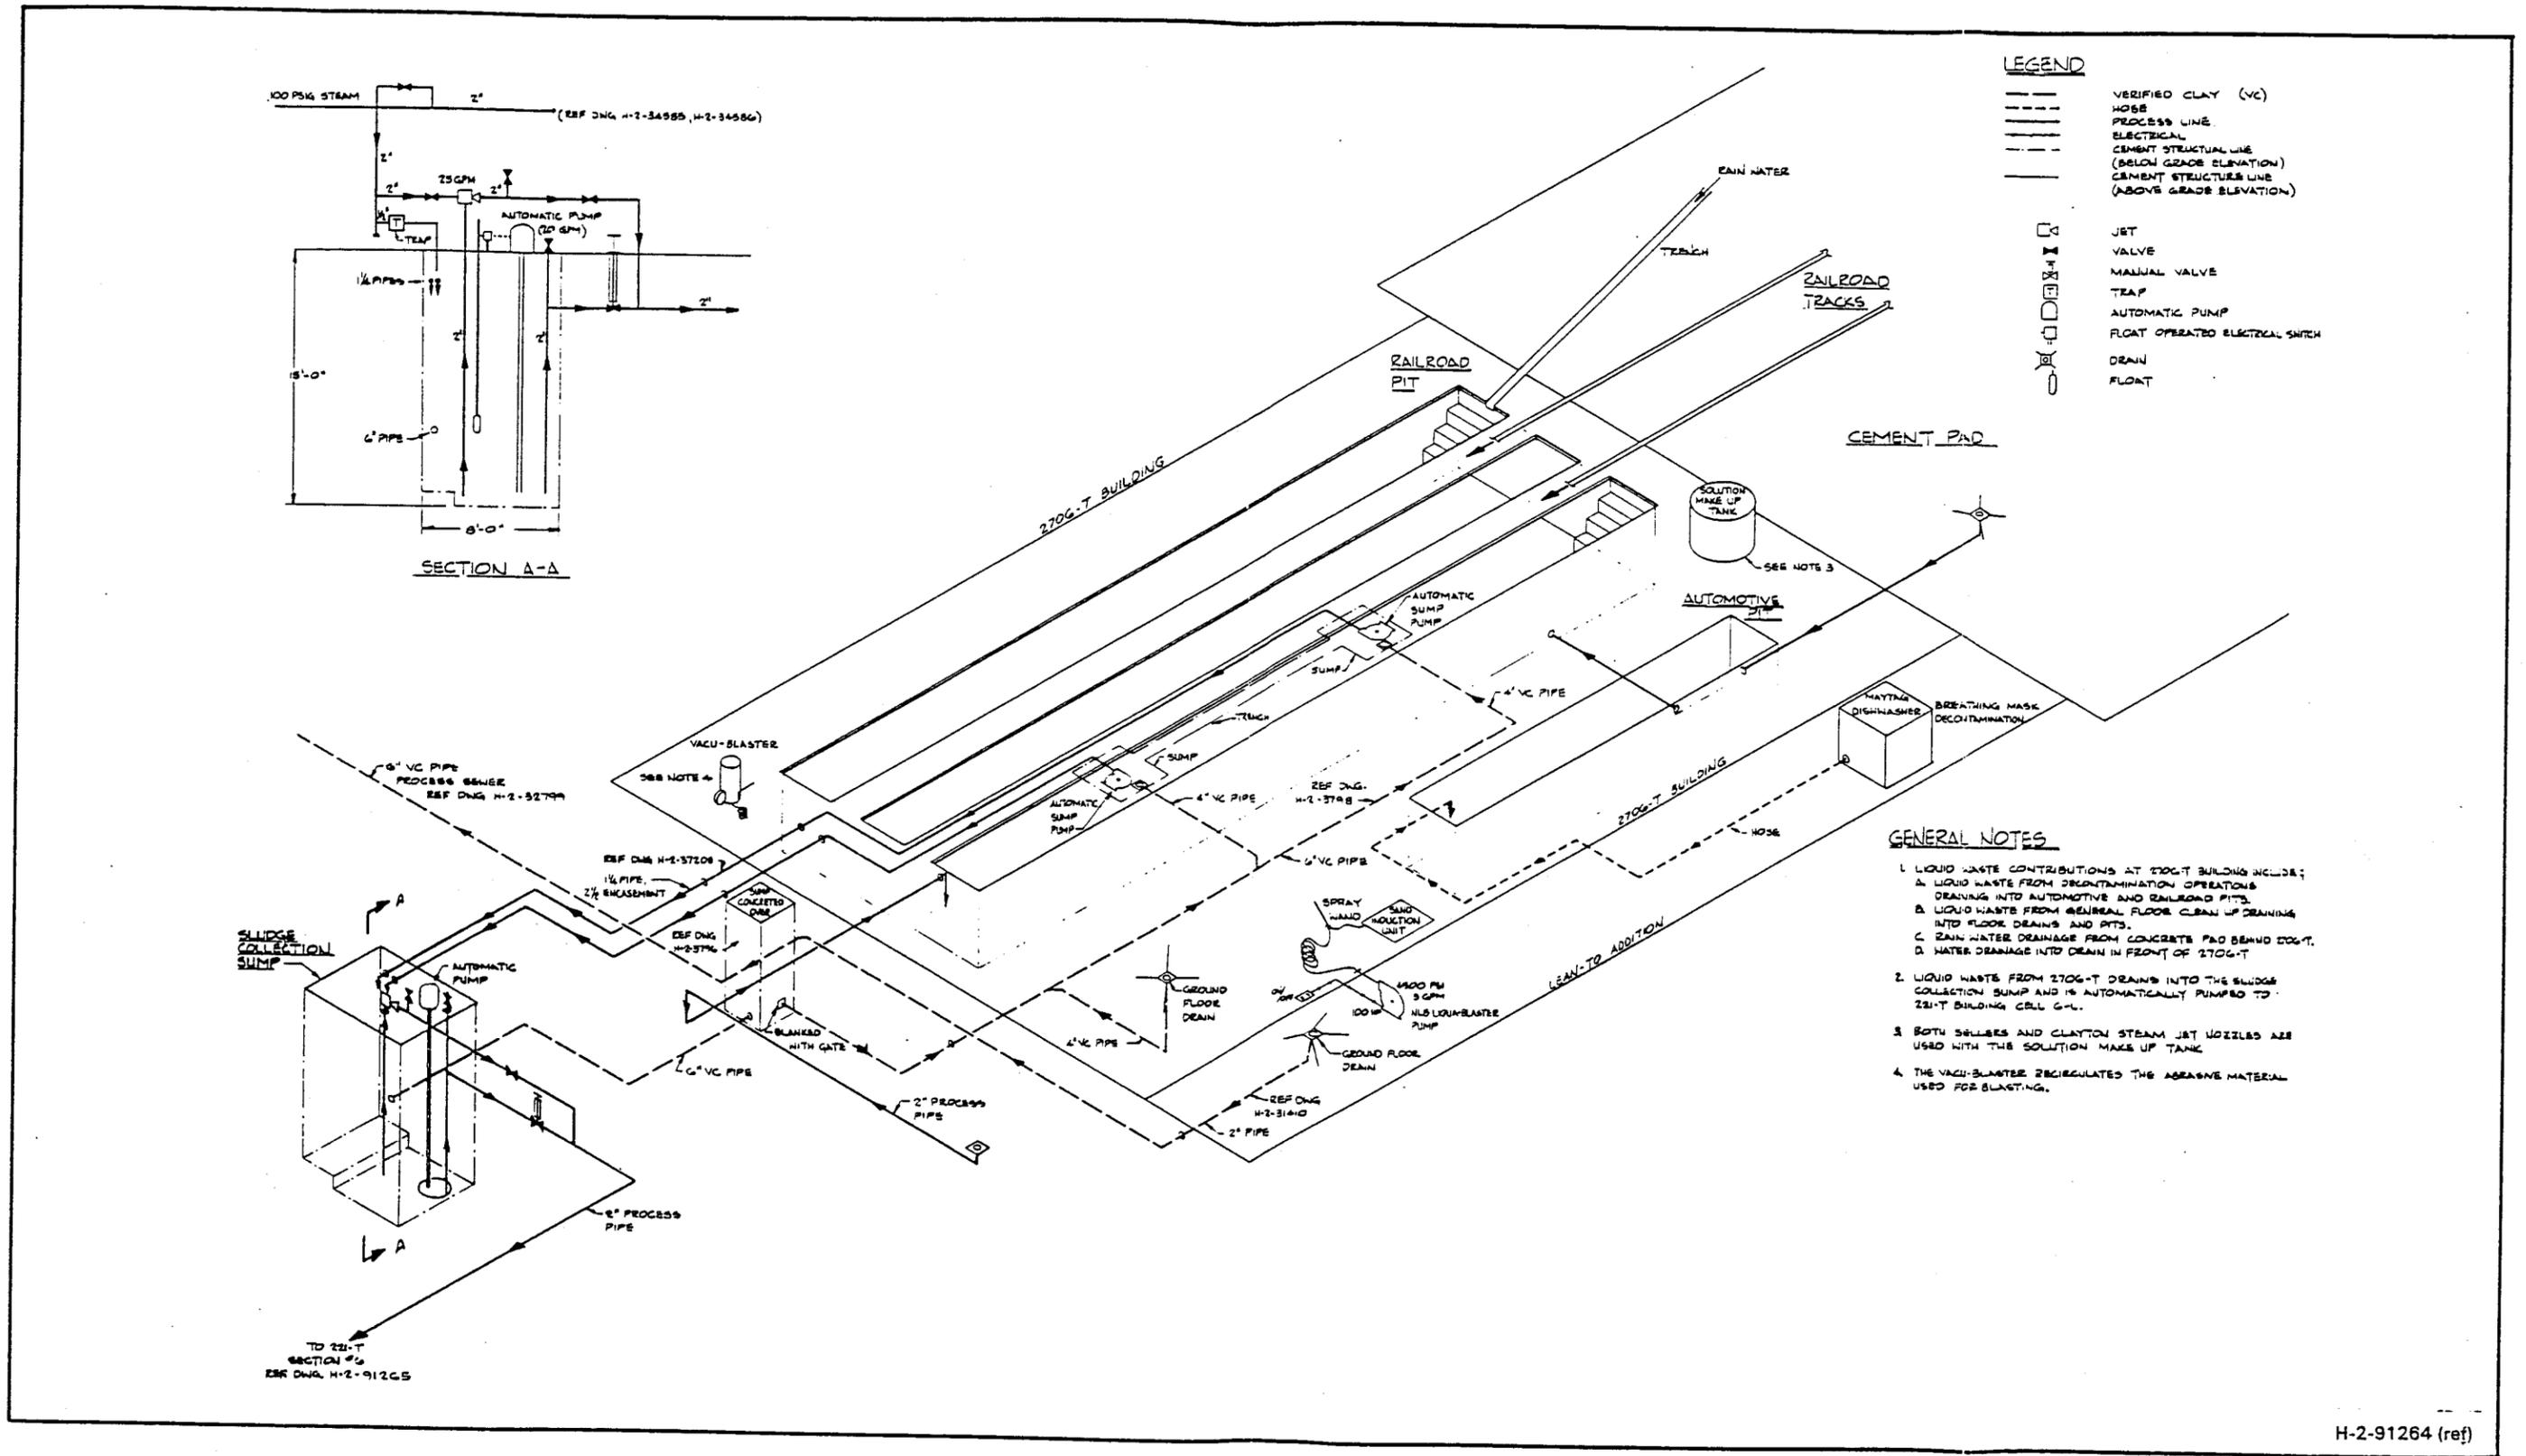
Building 221-T Canyon Liquid Waste System.
